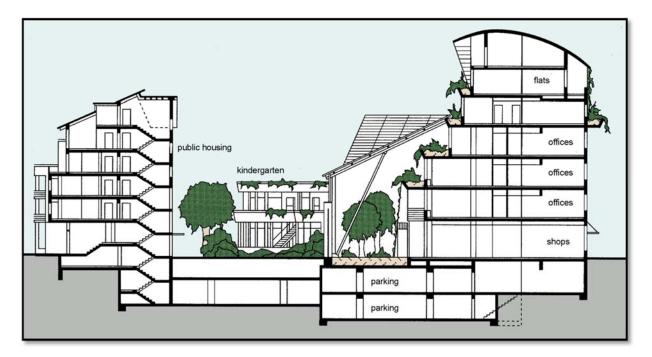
Section of the South-West block: multi-storey housing, elevation of the two-storied kindergarten, the landscaped courtyard garden and play ground, four-storied atrium space and the terraced main office building topped by two floors of flats (Löhnert: 1998 & by Author)
